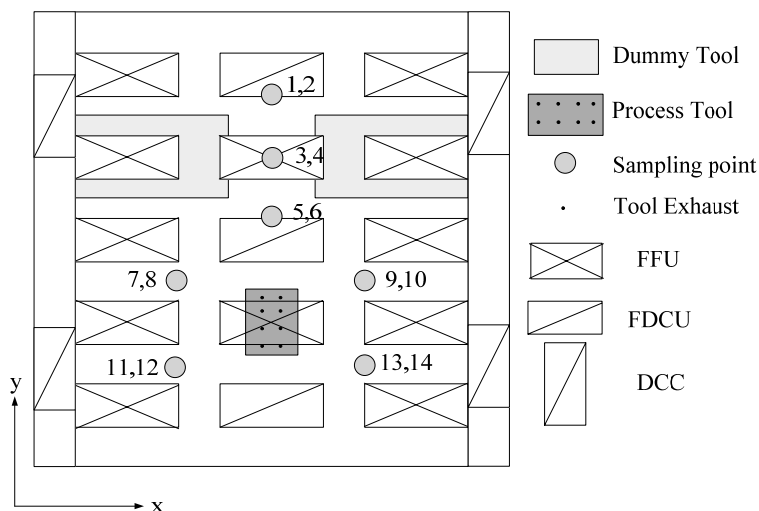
Plan of a cleanroom with wall-return and FDCU-return arrangements.
